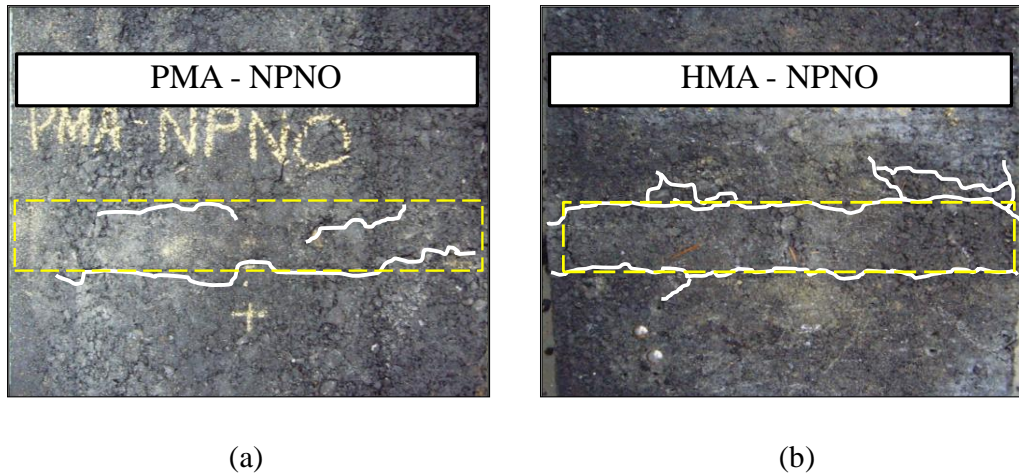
Surface cracking in new unreinforced pavements: (a) PMA pavement; and (b) HMA pavement
